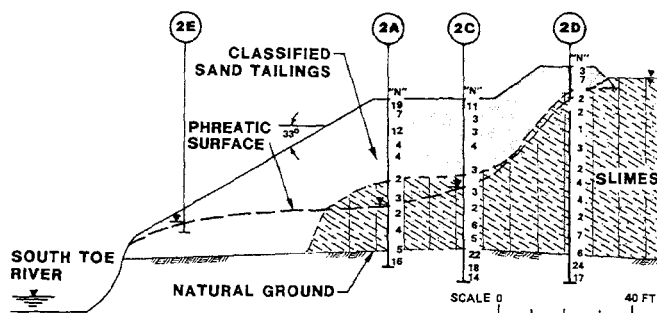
MICACEOUS WASTE TAILINGS DAM, NORTH CAROLINA SECTION THROUGH DAM NEAR FAILURE ZONE
